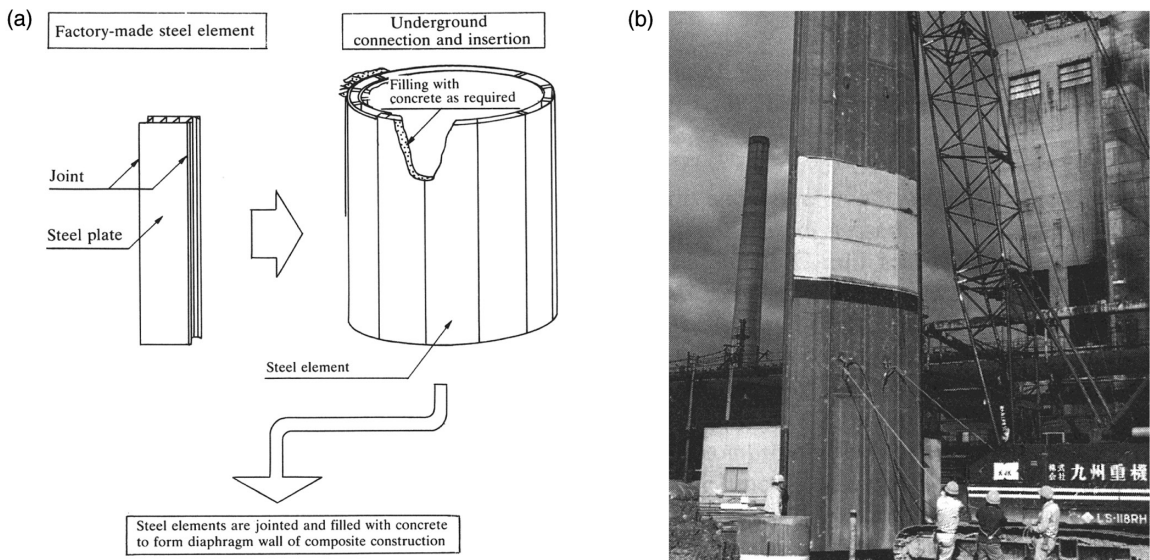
Outline of continuous steel underground wall and its application example⁸⁾
